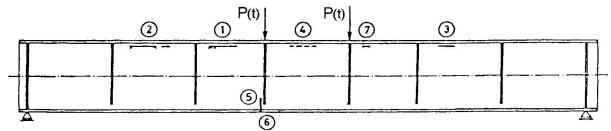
Fatigue cracks in the thin web along welded connections with compression flange and transverse stiffener, crack in tension flange.
